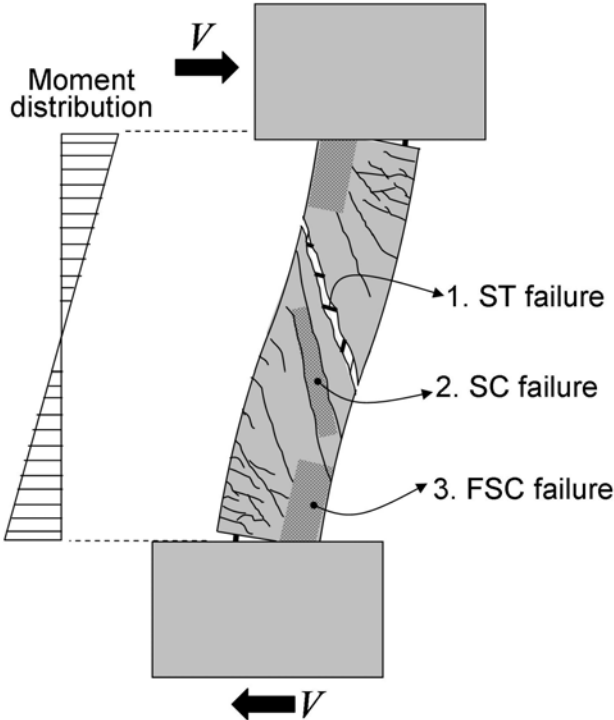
Shear failure type of post-tensioned precast concrete member
